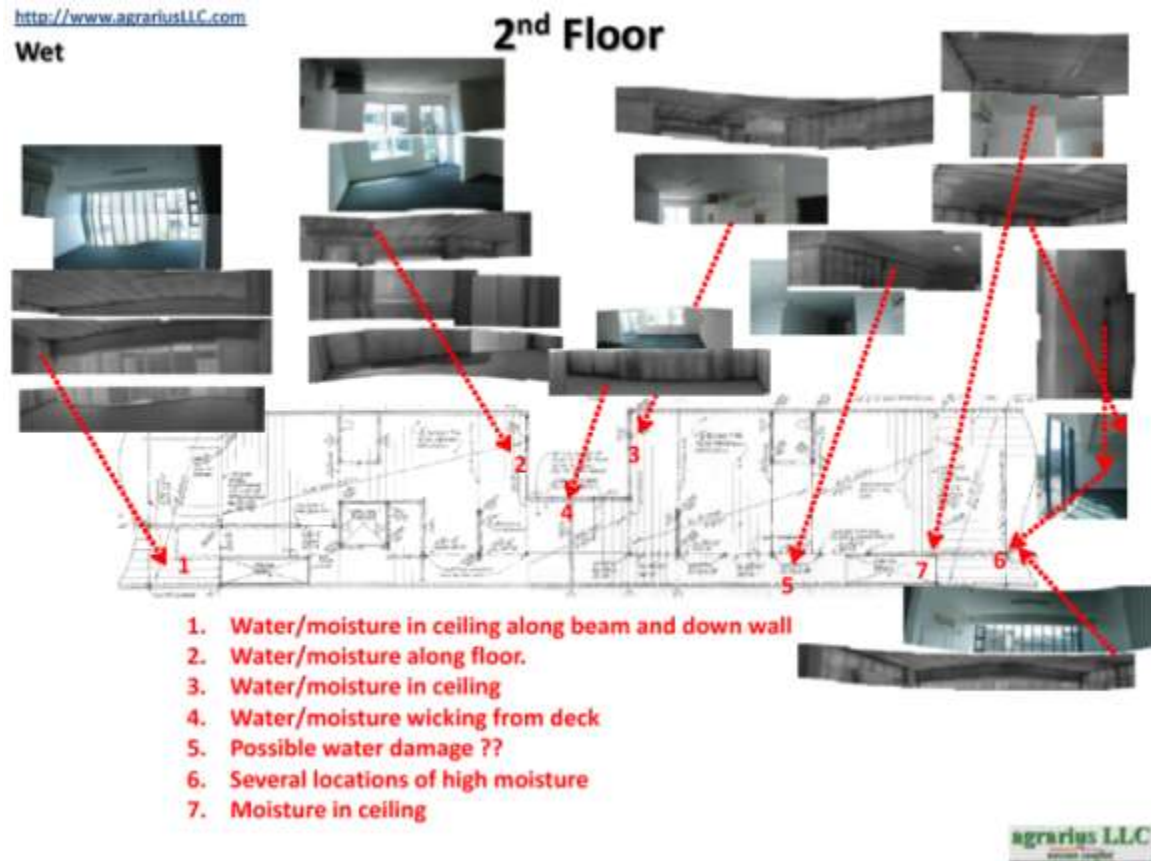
2<sup>nd</sup> Floor, 11 Sept
